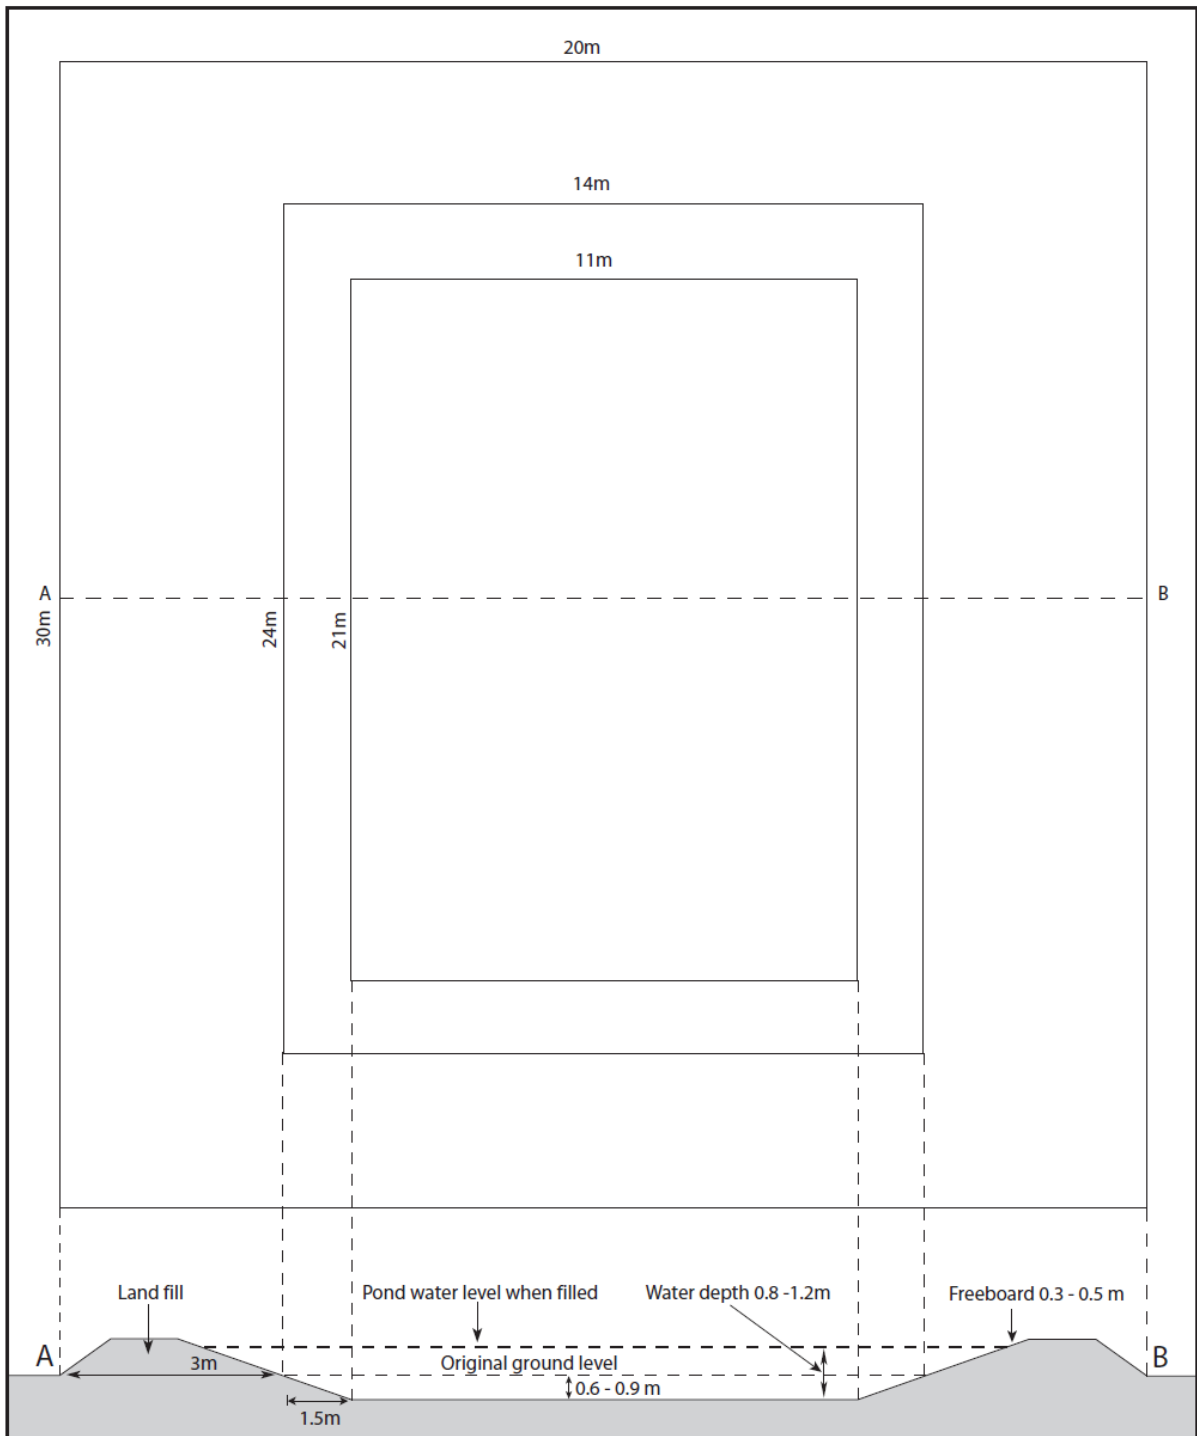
Ground plan for a hand-dug pond (top) and cross-section of pond along A-B (bottom)
